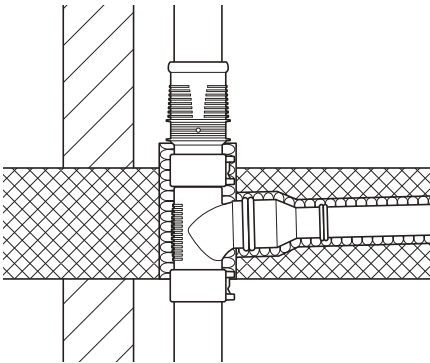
Equal branch fitting 88.5°, swept-entry, embedded in concrete, with reduced branch discharge pipe
